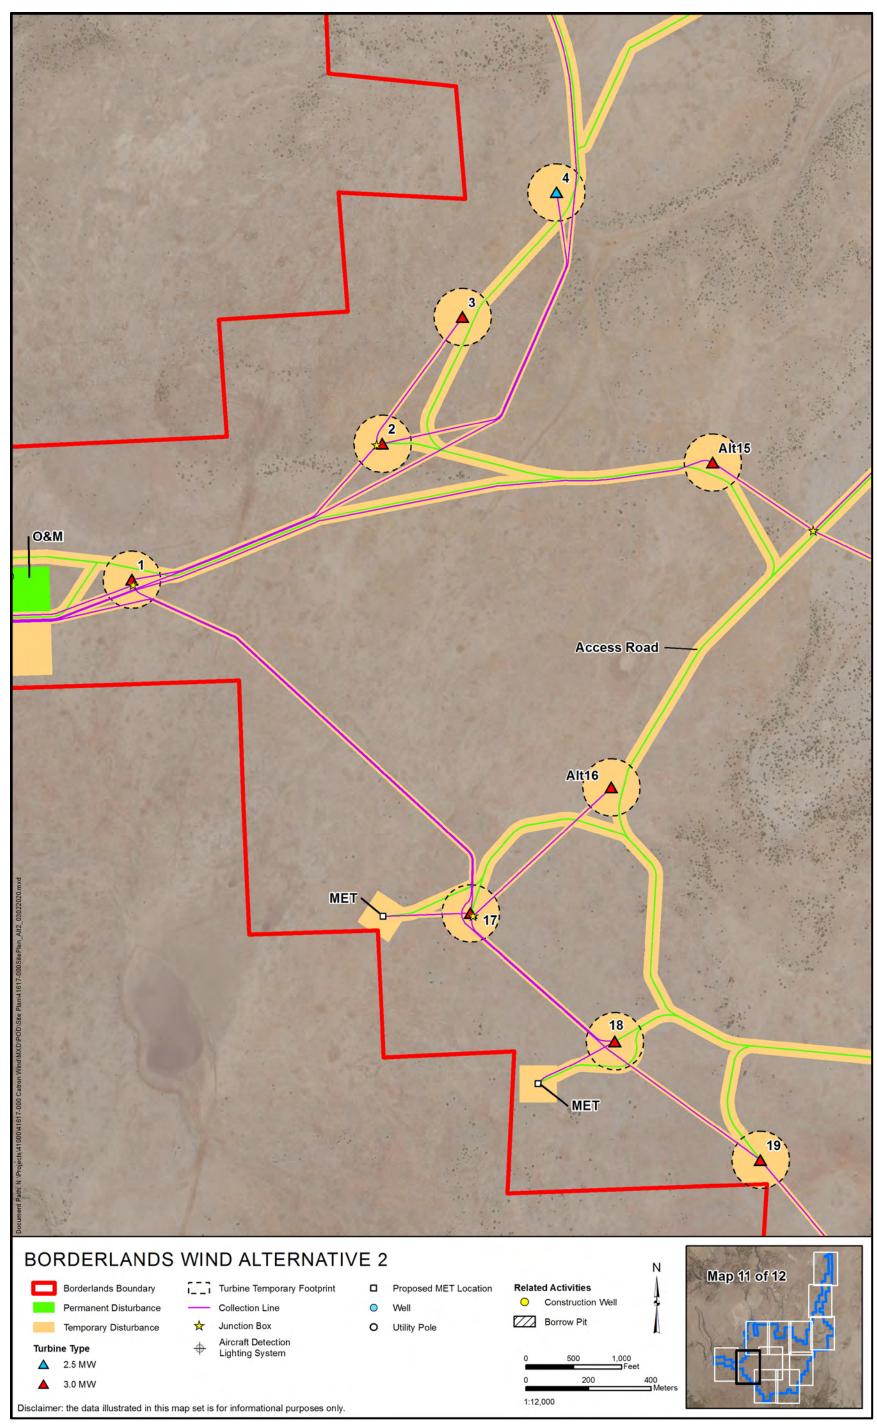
Alternative 2 Site Plan (Map 11 of 12)
